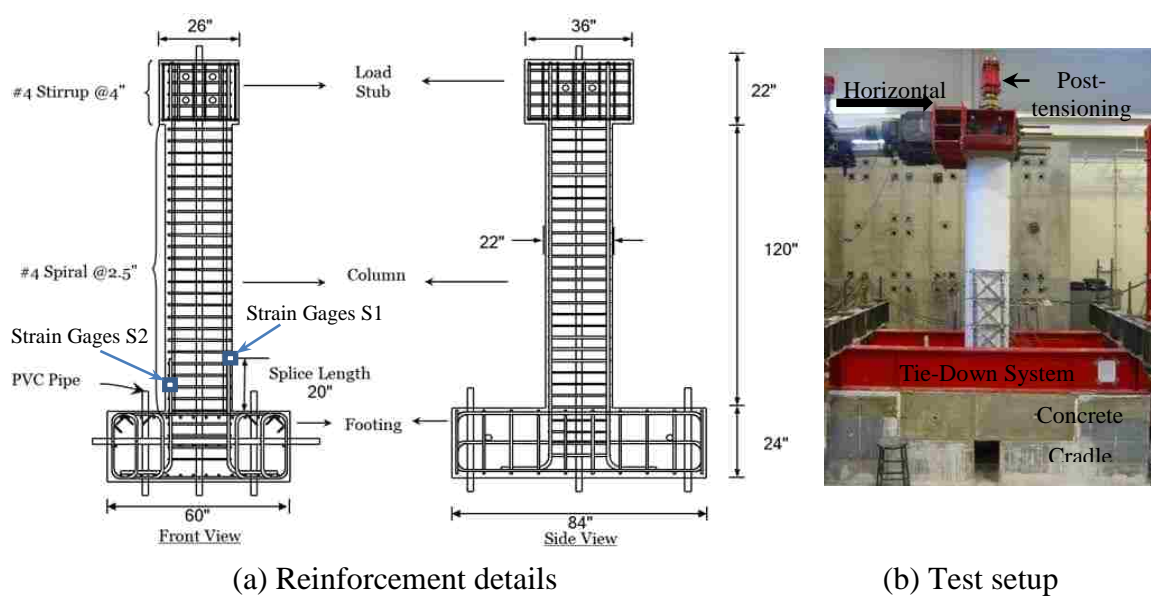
Details of Column Specimens (1in. = 25.4 mm.)
